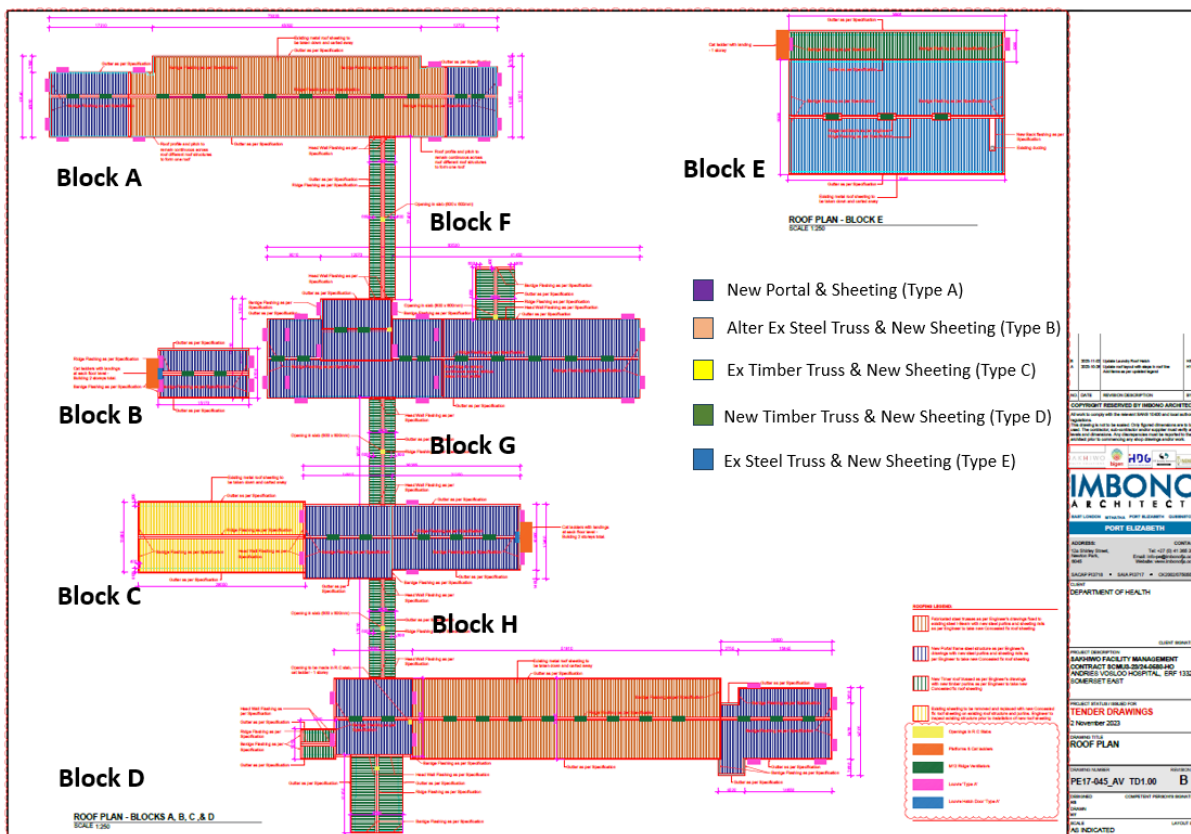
Andries Vosloo Hospital, Drawing depicting Roof works required per block.
